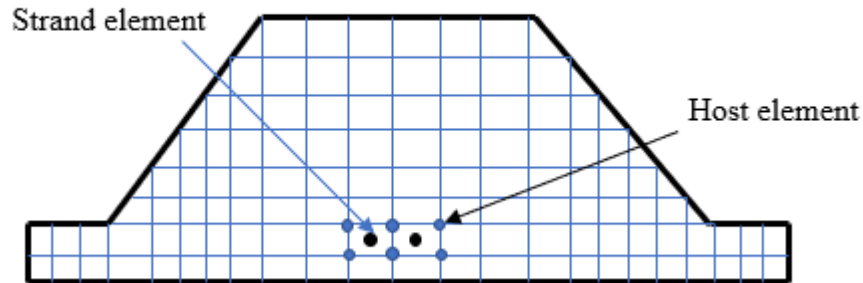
Finite Element Modeling of a Pretensioned Concrete Members using the Embedment Technique
